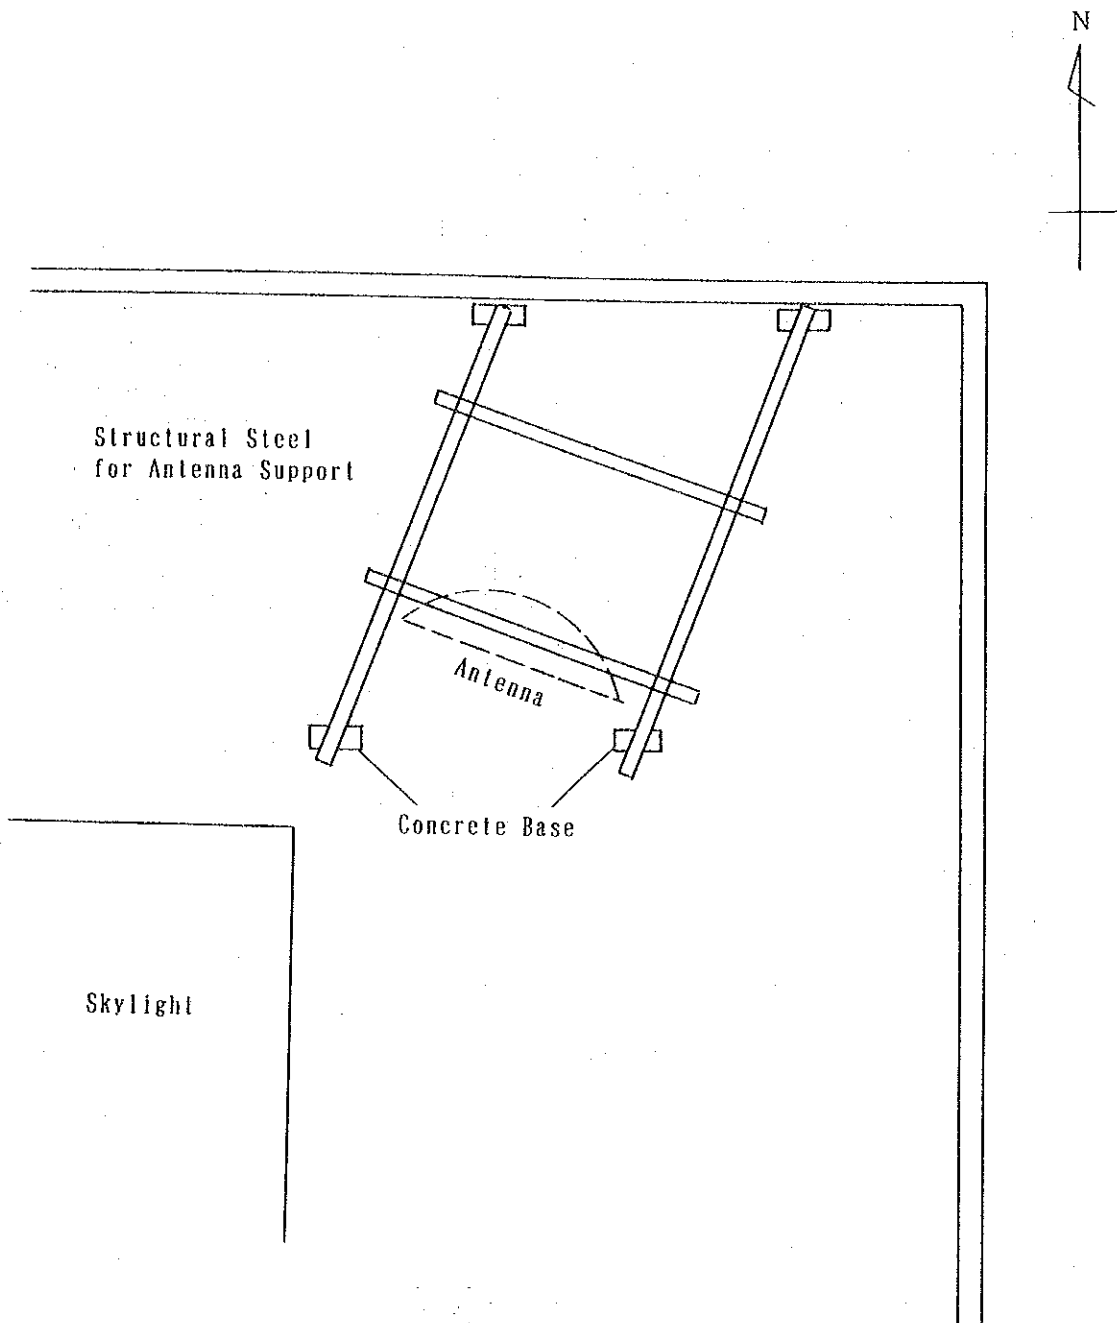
Layout of Structural Steel for the Satellite Antenna on the Roof of Building B
